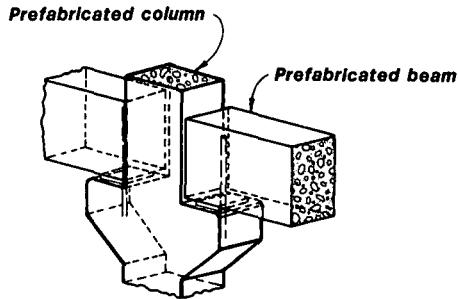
Example of a "Hinged" Beam-Column Connection in a Frame System.
